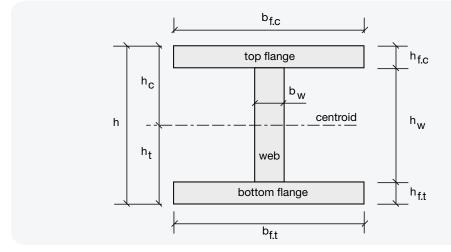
Notation for an individual 'cassette' in a typical composite timber floor design procedure.
